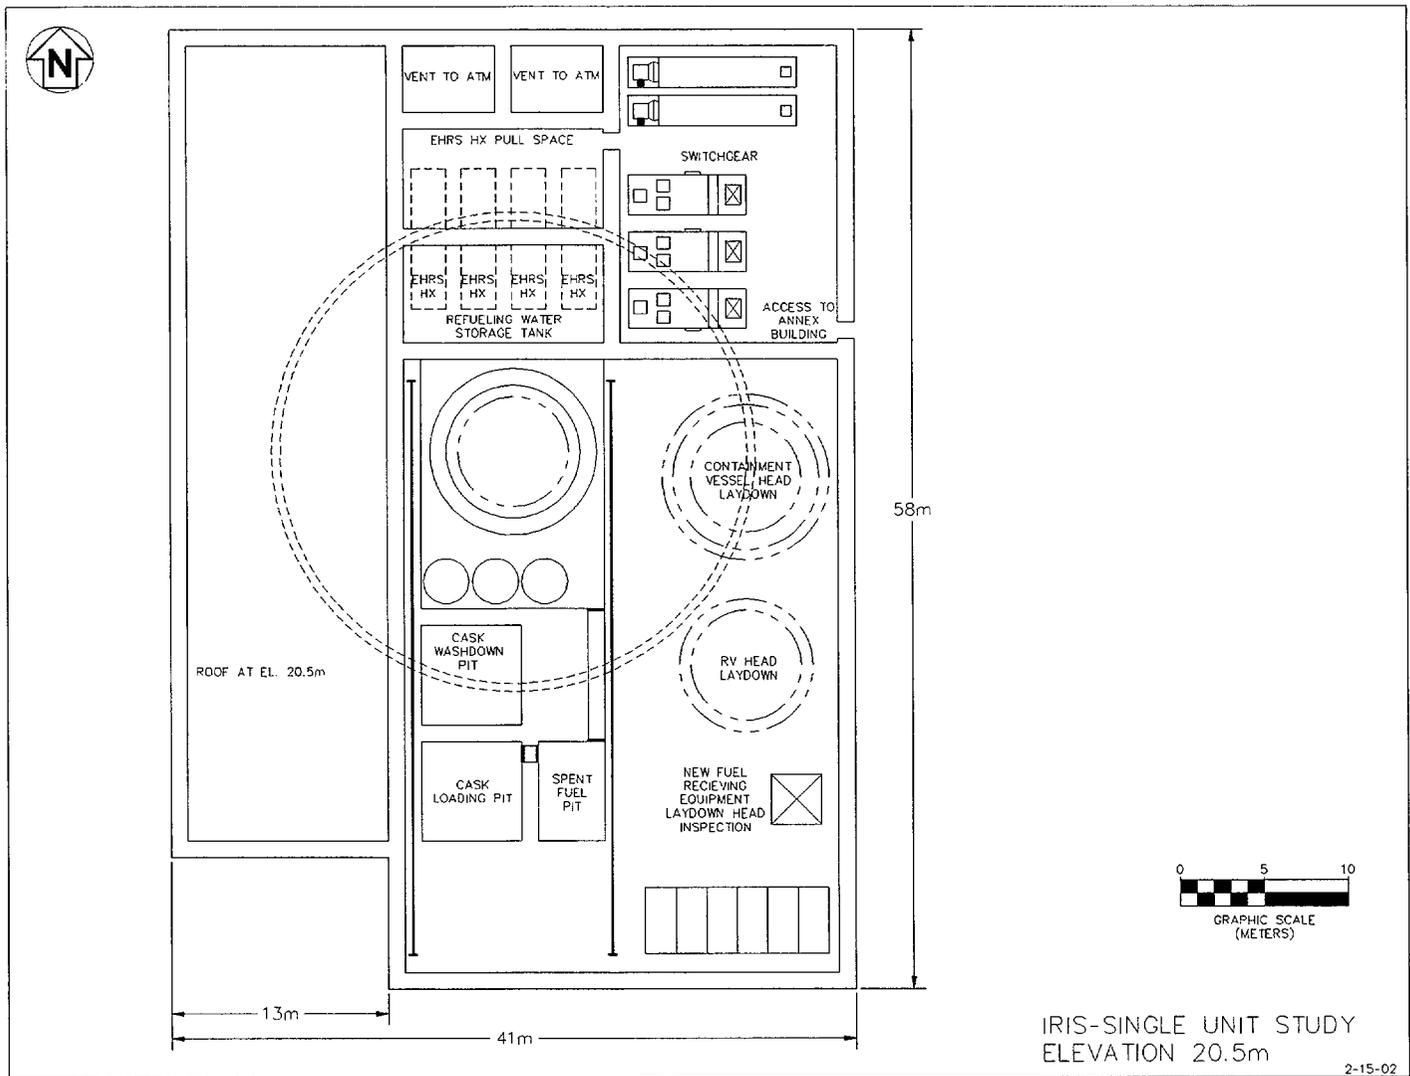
, IRIS Auxiliary Building General Arrangement at Elevation +20.5 Meters
